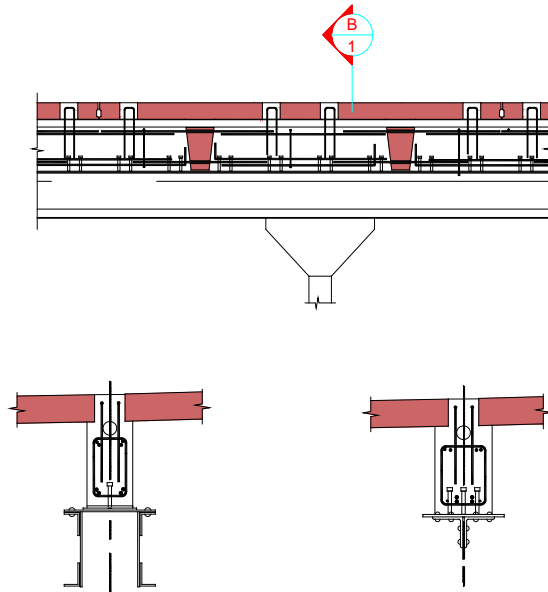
Composite Action between the Precast Deck and either the Plate Girder Top Flange or the deck Truss Top Chord.
